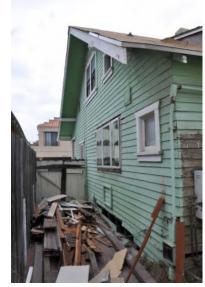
West façade with the tripartite replacement window. View facing northeast.
